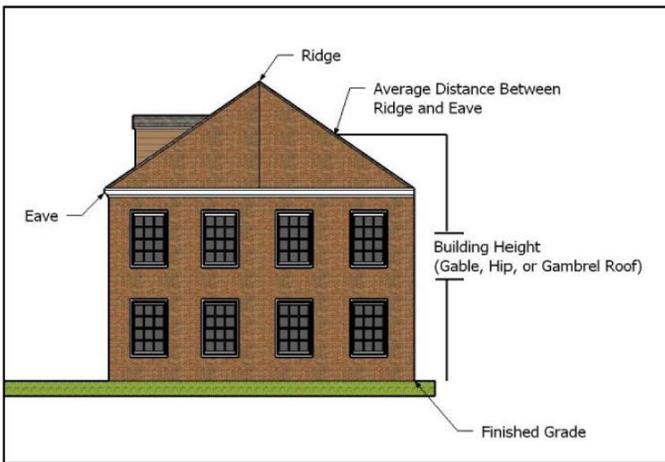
Building Height - Gable, Hipped, or Gambrel Roof
